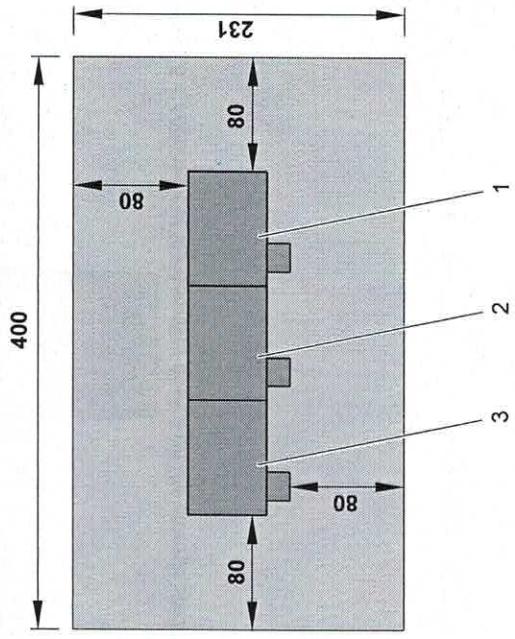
Assembly plan for the system – accessible everywhere (units given in cm)
